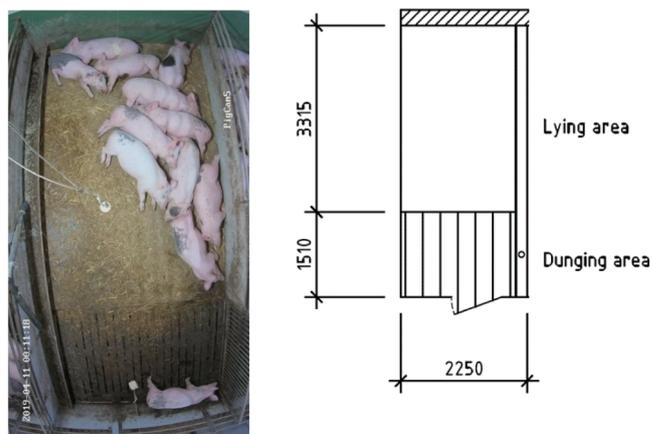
Design of the pen used for growing/finishing pigs. The lying area consists of solid concrete and the dunging area of slatted concrete floor.
